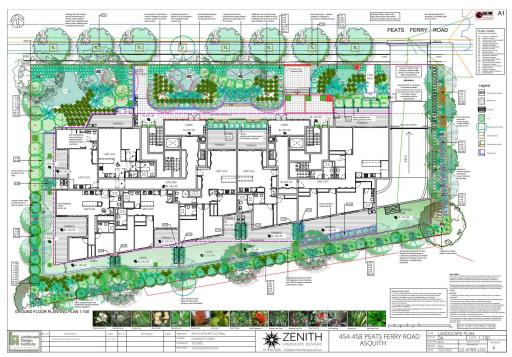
Landscape Plan Amended (source: Landscape Plans prepared by Zenith Landscape Designs)
